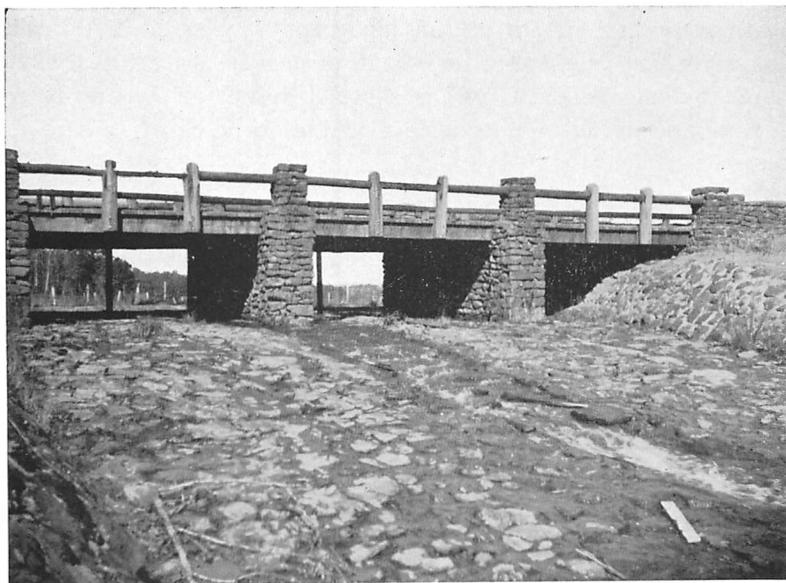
Highway bridge and spillway at the southeast end of Lake Choctaw; native rock used for bridge piers and spillway floor. February 12, 1943.
